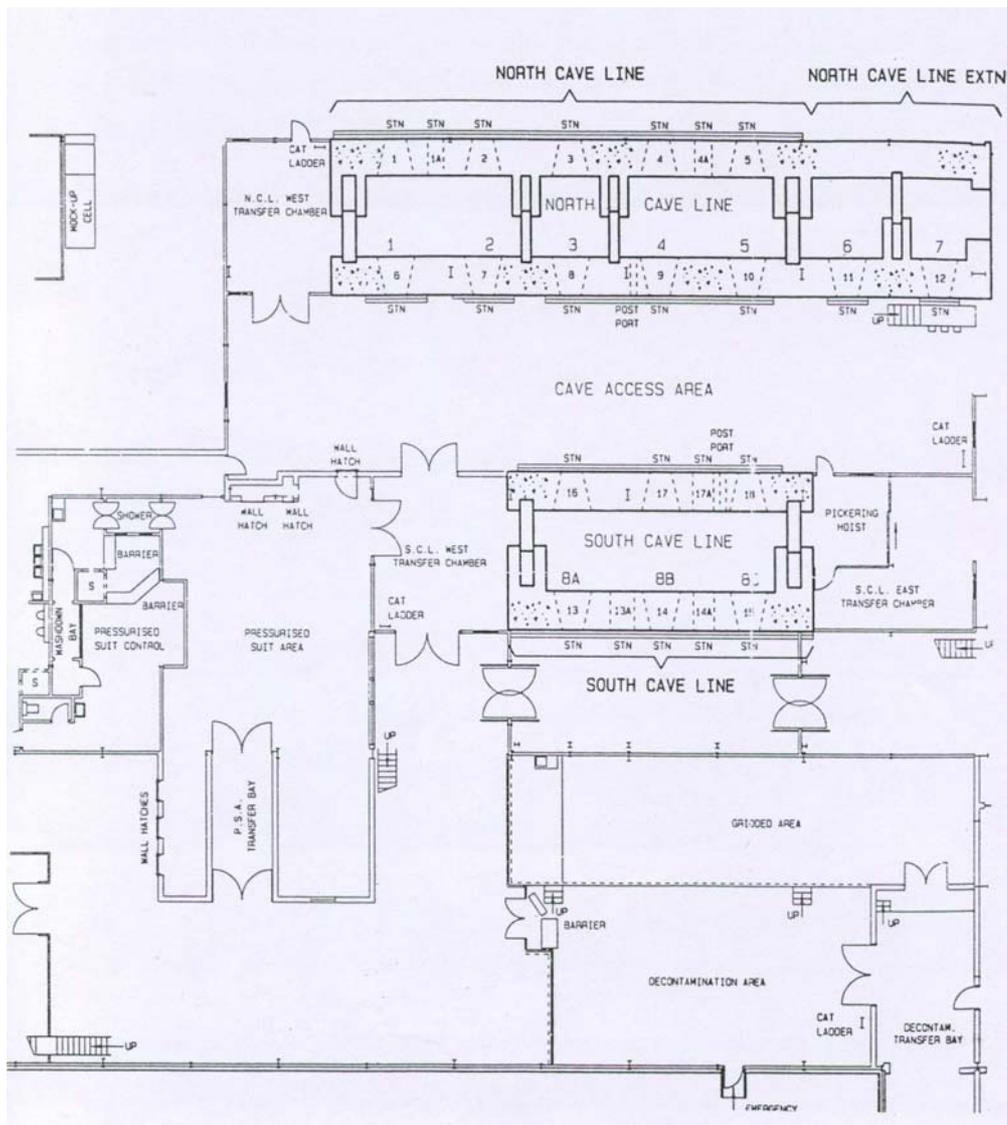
Diagram of the layout of shielded facilities in Building A59 at Winfrith
